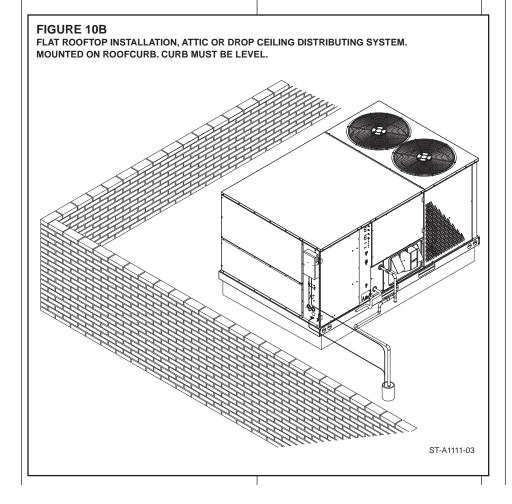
A FLAT ROOFTOP INSTALLATION, ATTIC OR DROP CEILING DISTRIBUTING SYSTEM. MOUNTED ON ROOFCURB. CURB MUST BE LEVEL. ST-A1111-03
